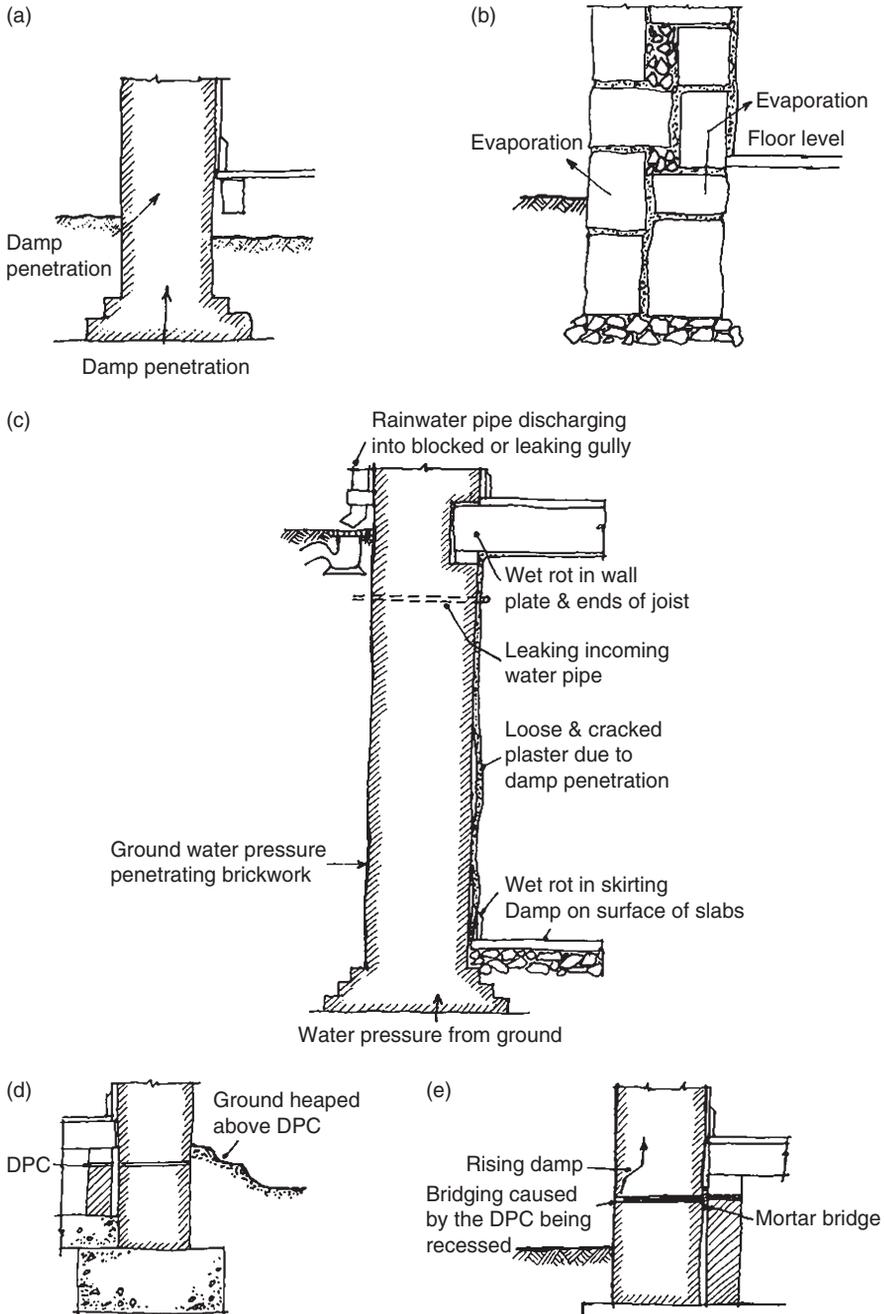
(a) Typical early nineteenth century external wall construction with no DPC. (b) Traditional solid stone wall. No DPC. (c) Typical damp problems in old basement walls. (d) DPC covered by earth. (e) Defects caused by bridging DPC
